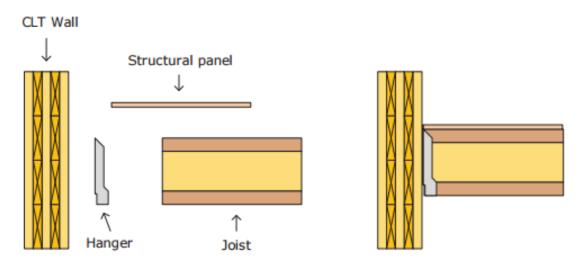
CLT Wall I-joist. (CLT Handbook 2011 [adapted from TRADA 2009])
